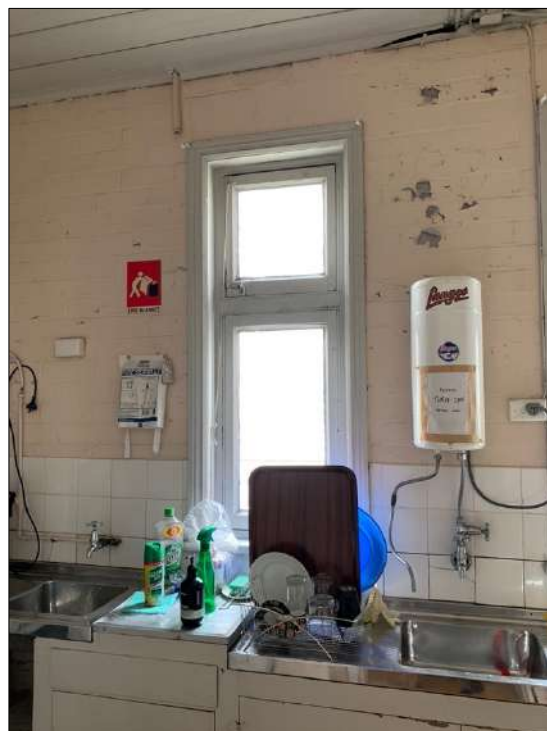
Kitchenette fitout. The utility rooms have timber ceilings.
